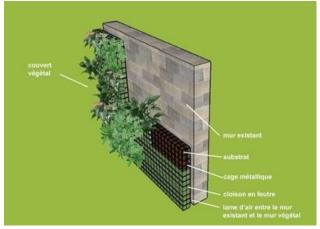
Cross-section of a green wall, www.murmurev egetal.com.
